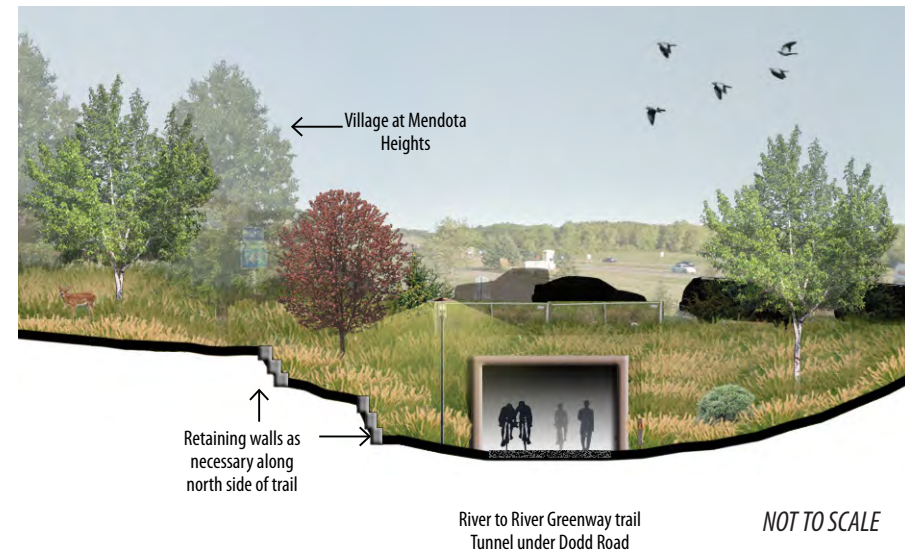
Dodd Road Underpass Conceptual Section Looking North
